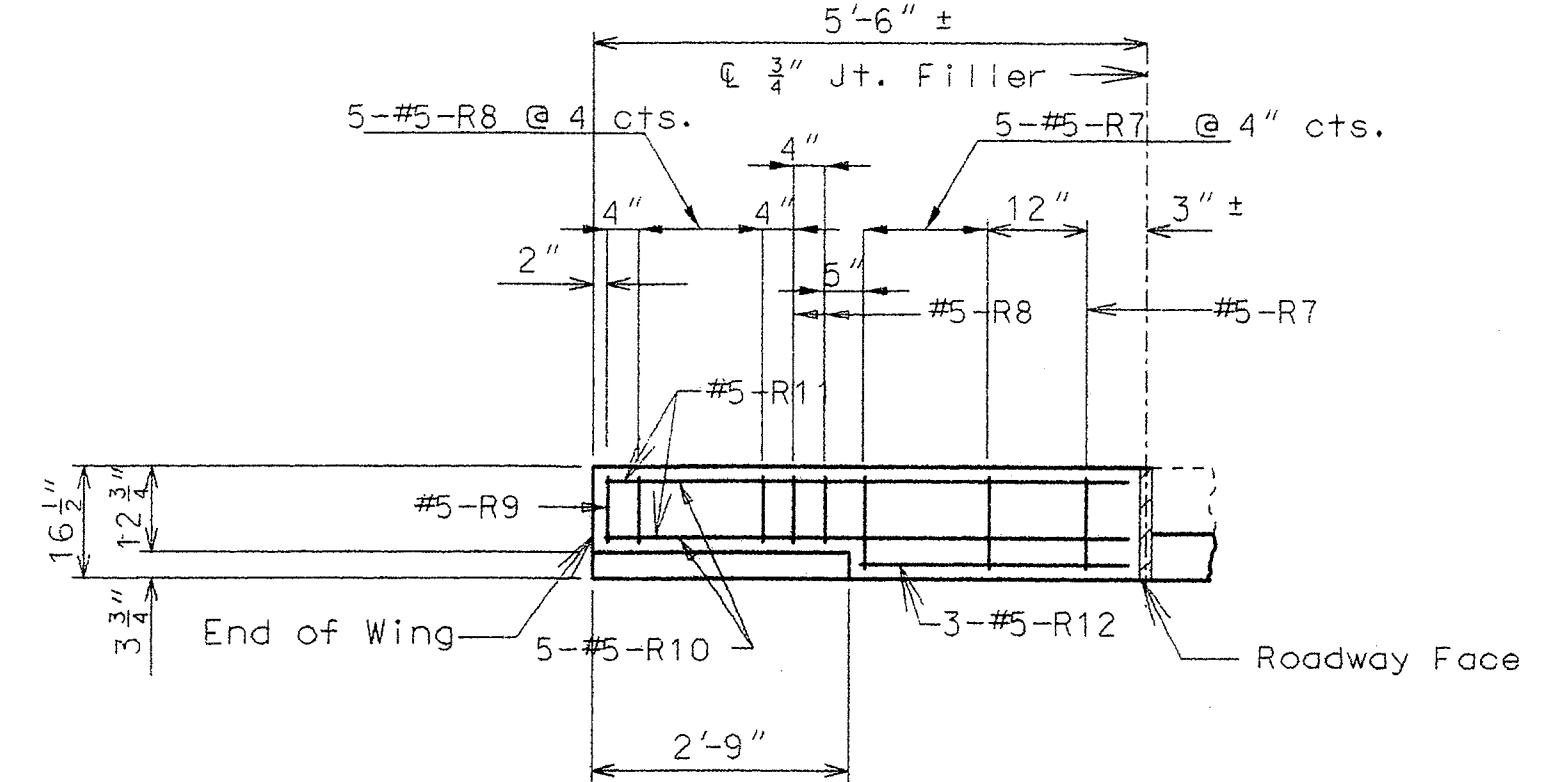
DETAILS OF BLOCKOUT ON WINGS (NORTHEAST WING SHOWN OTHER WINGS SIMILAR)
